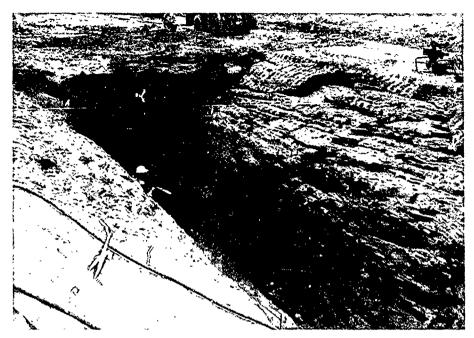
Hydropower conduit, looking downstream, Sta. 29+20.
